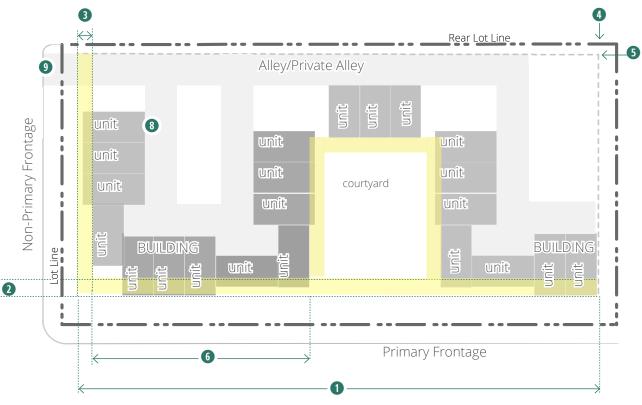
F-5. Row Building: Courtyard Layout Example
